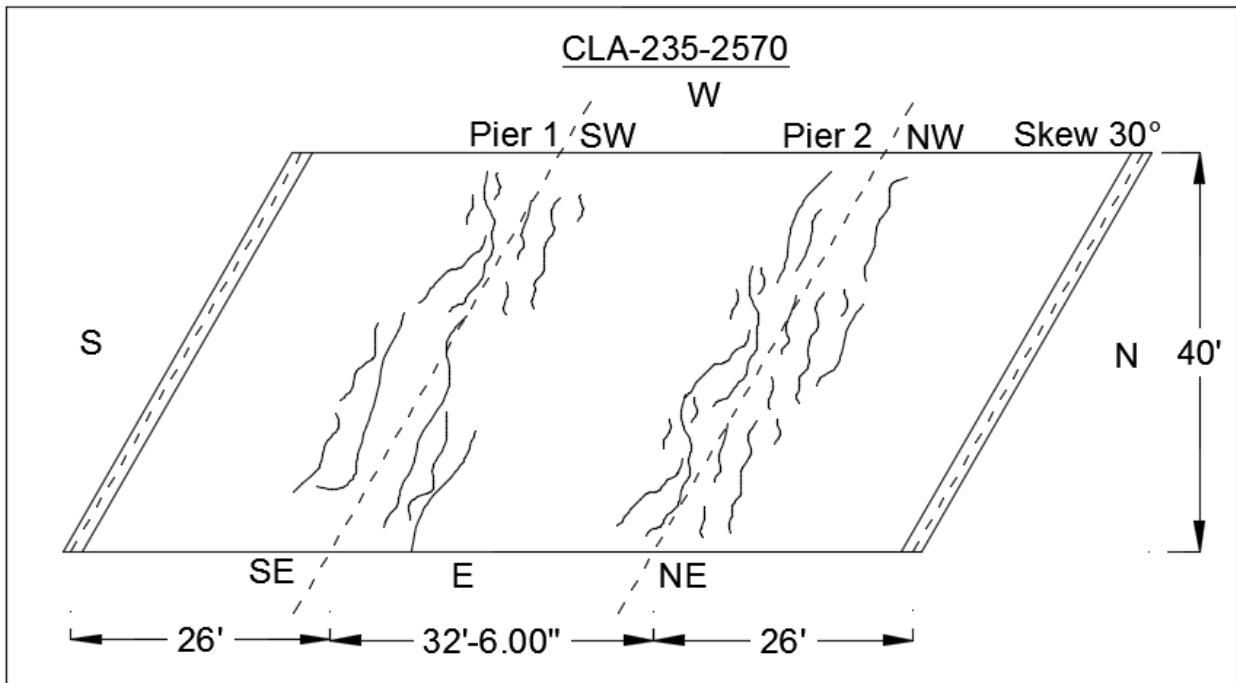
Bridge Inspection Pictures and Crack Map – CLA-235-2570
